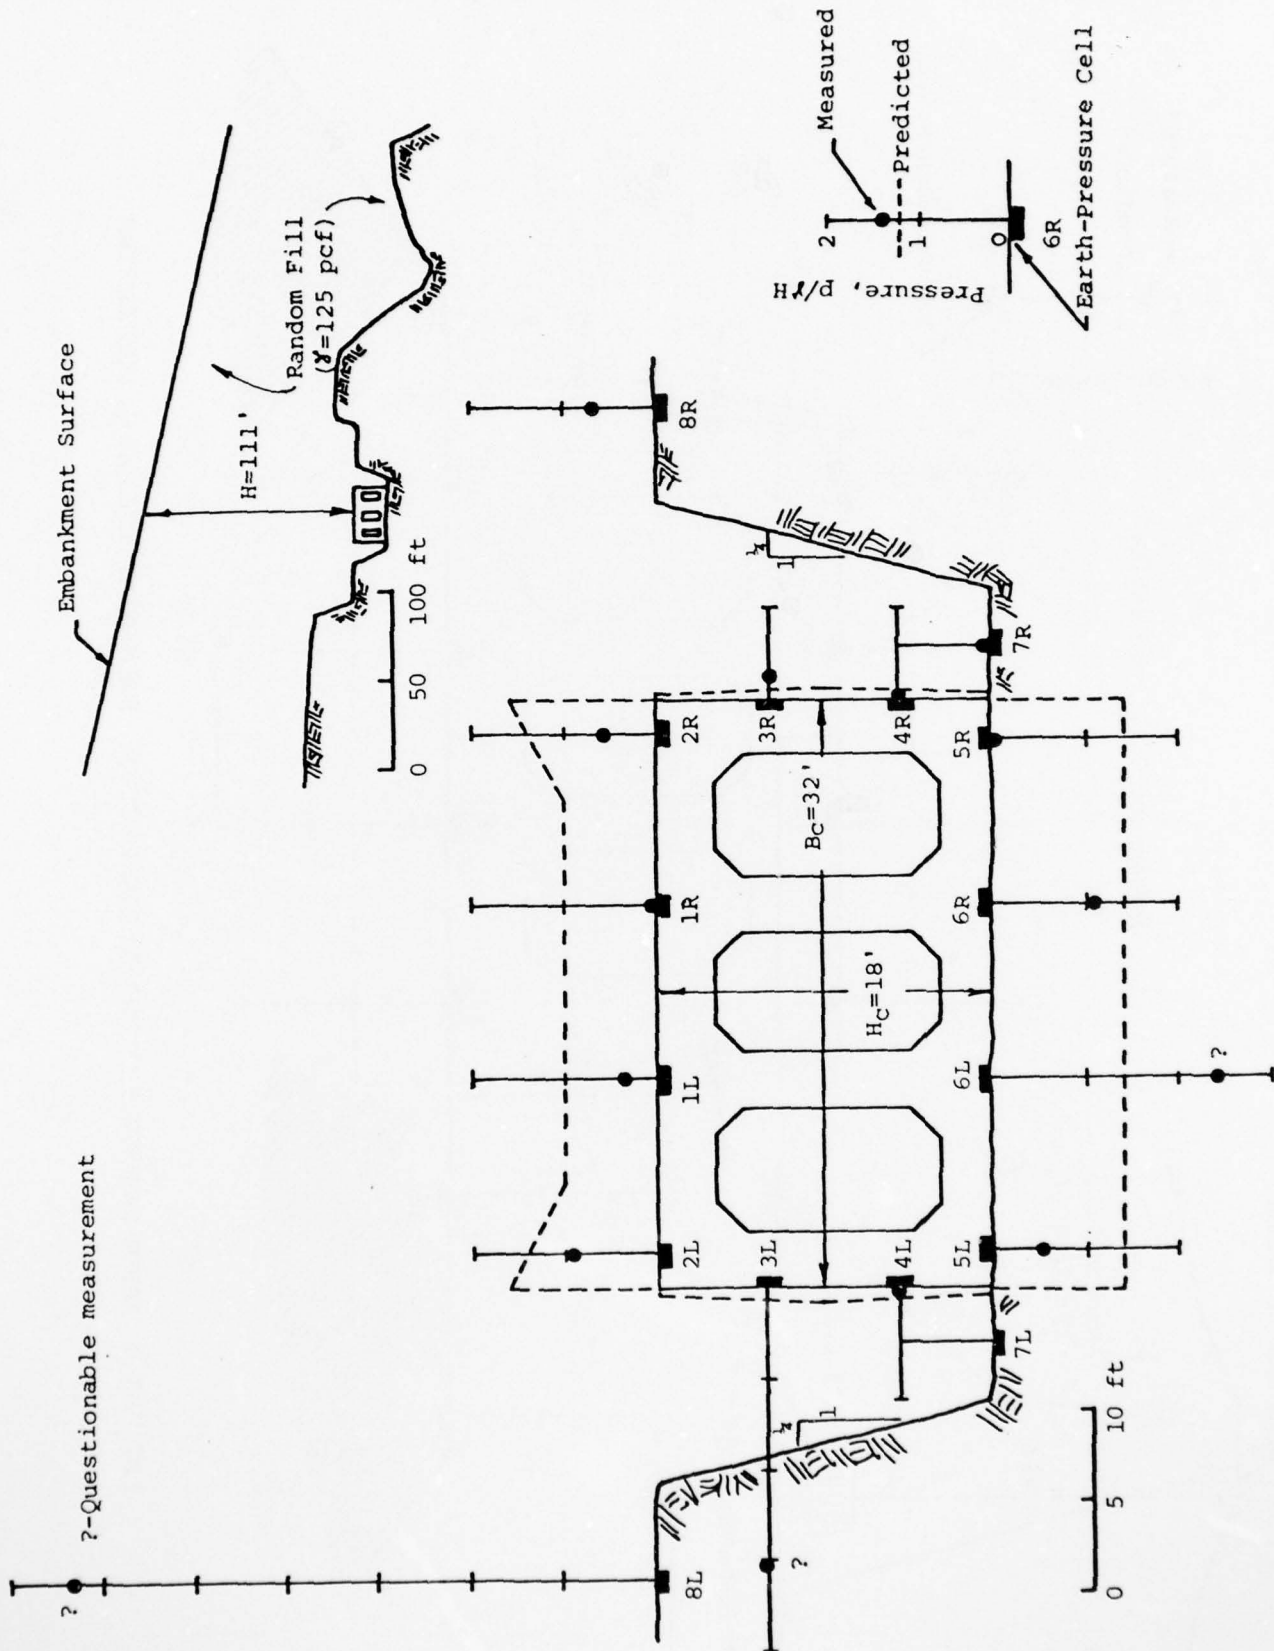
EARTH PRESSURES AT END OF CONSTRUCTION, INSTRUMENT STATION A, COCHITI DAM
